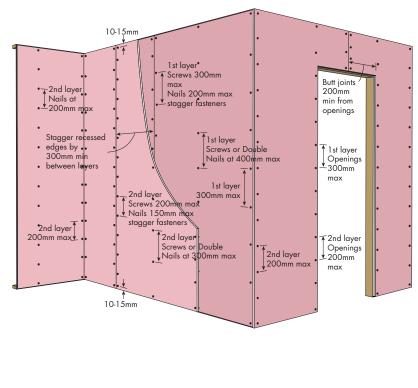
Fire Rated 2 Layers - Horizontal + Horizontal
